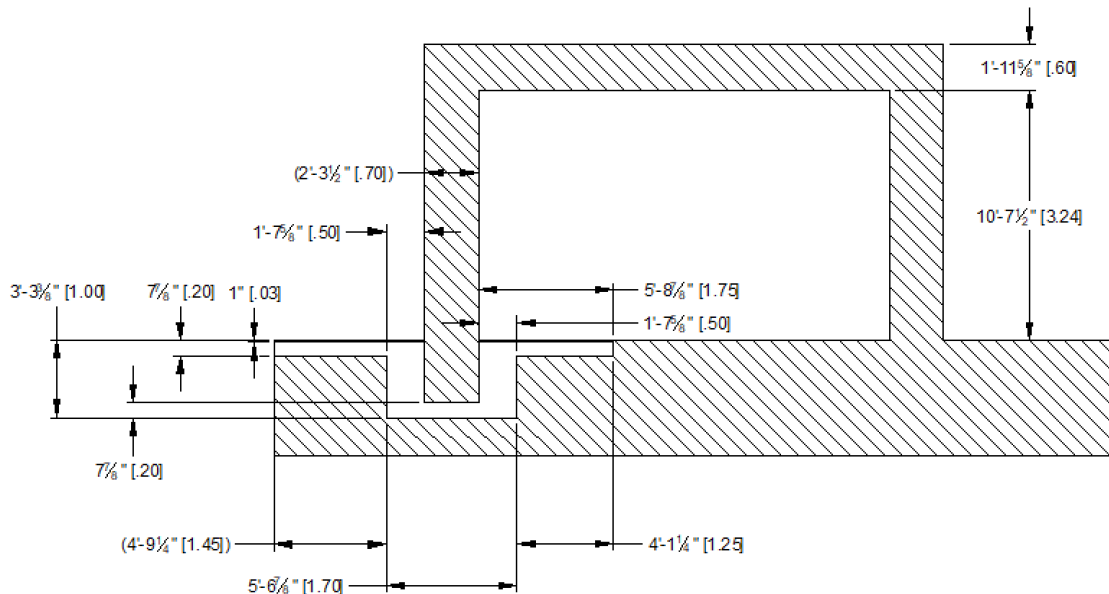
F-hutch floor labyrinth detail. (Beam direction into page).
